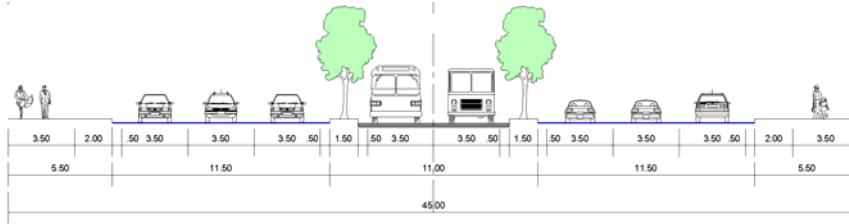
Cross Section of Av. Augusto Montenegro
